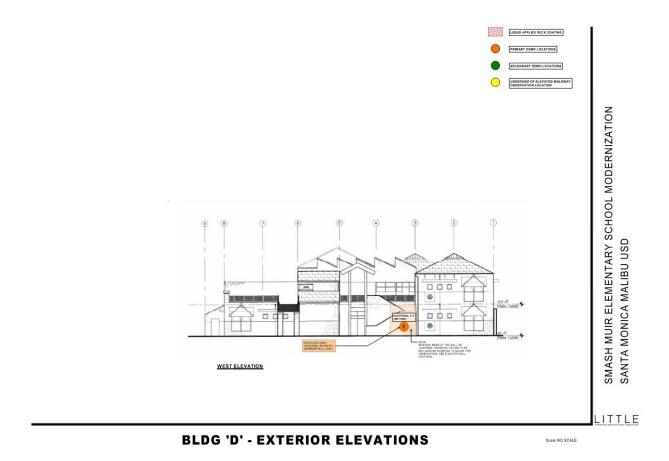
Demo Locations, Bldg D_Exterior Elevations_Demo Locations.
